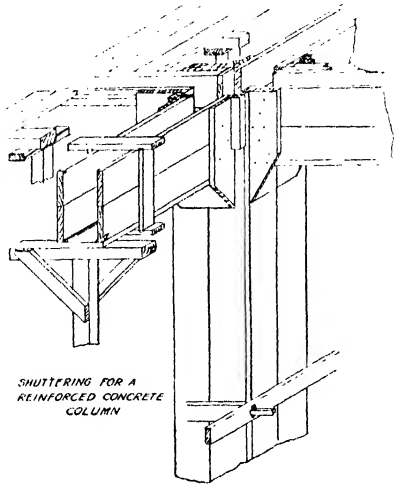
Composite Drawing of Beams, Floors and Column.
